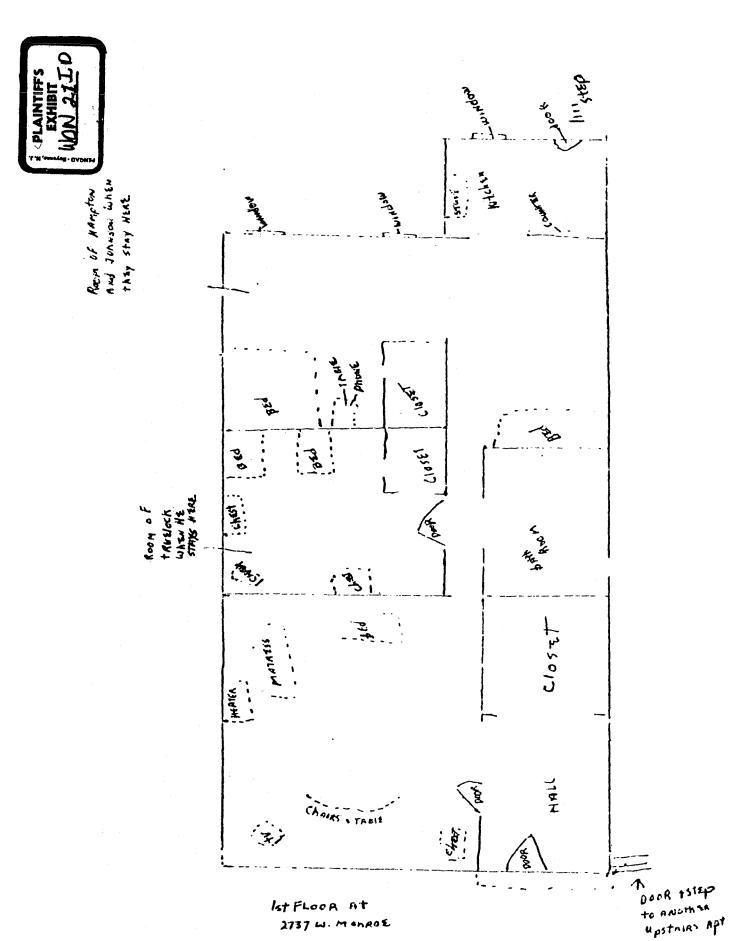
THE MITCHELL/O'NEAL FLOORPLAN, DEPICTING AND MARKING THE BED ON WHICH HAMPTON WAS KILLED
